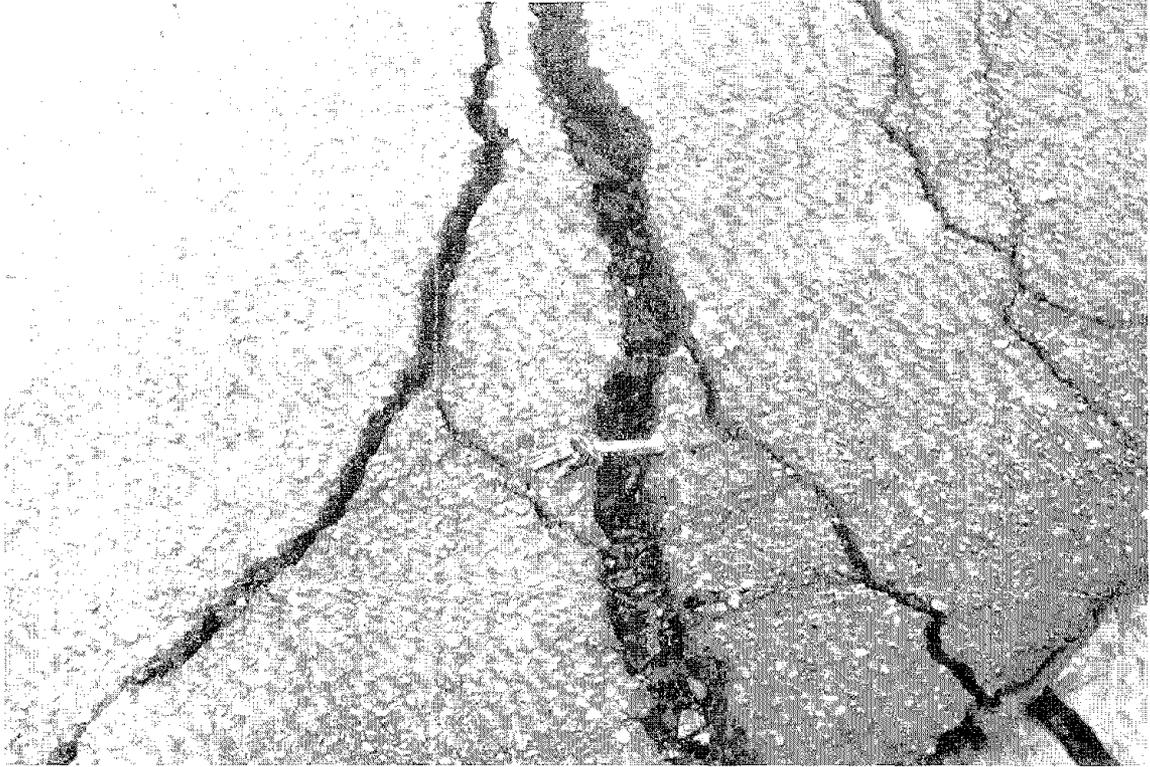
Close-Up of Superficial Road Cracks Shown in Figure 3-20
